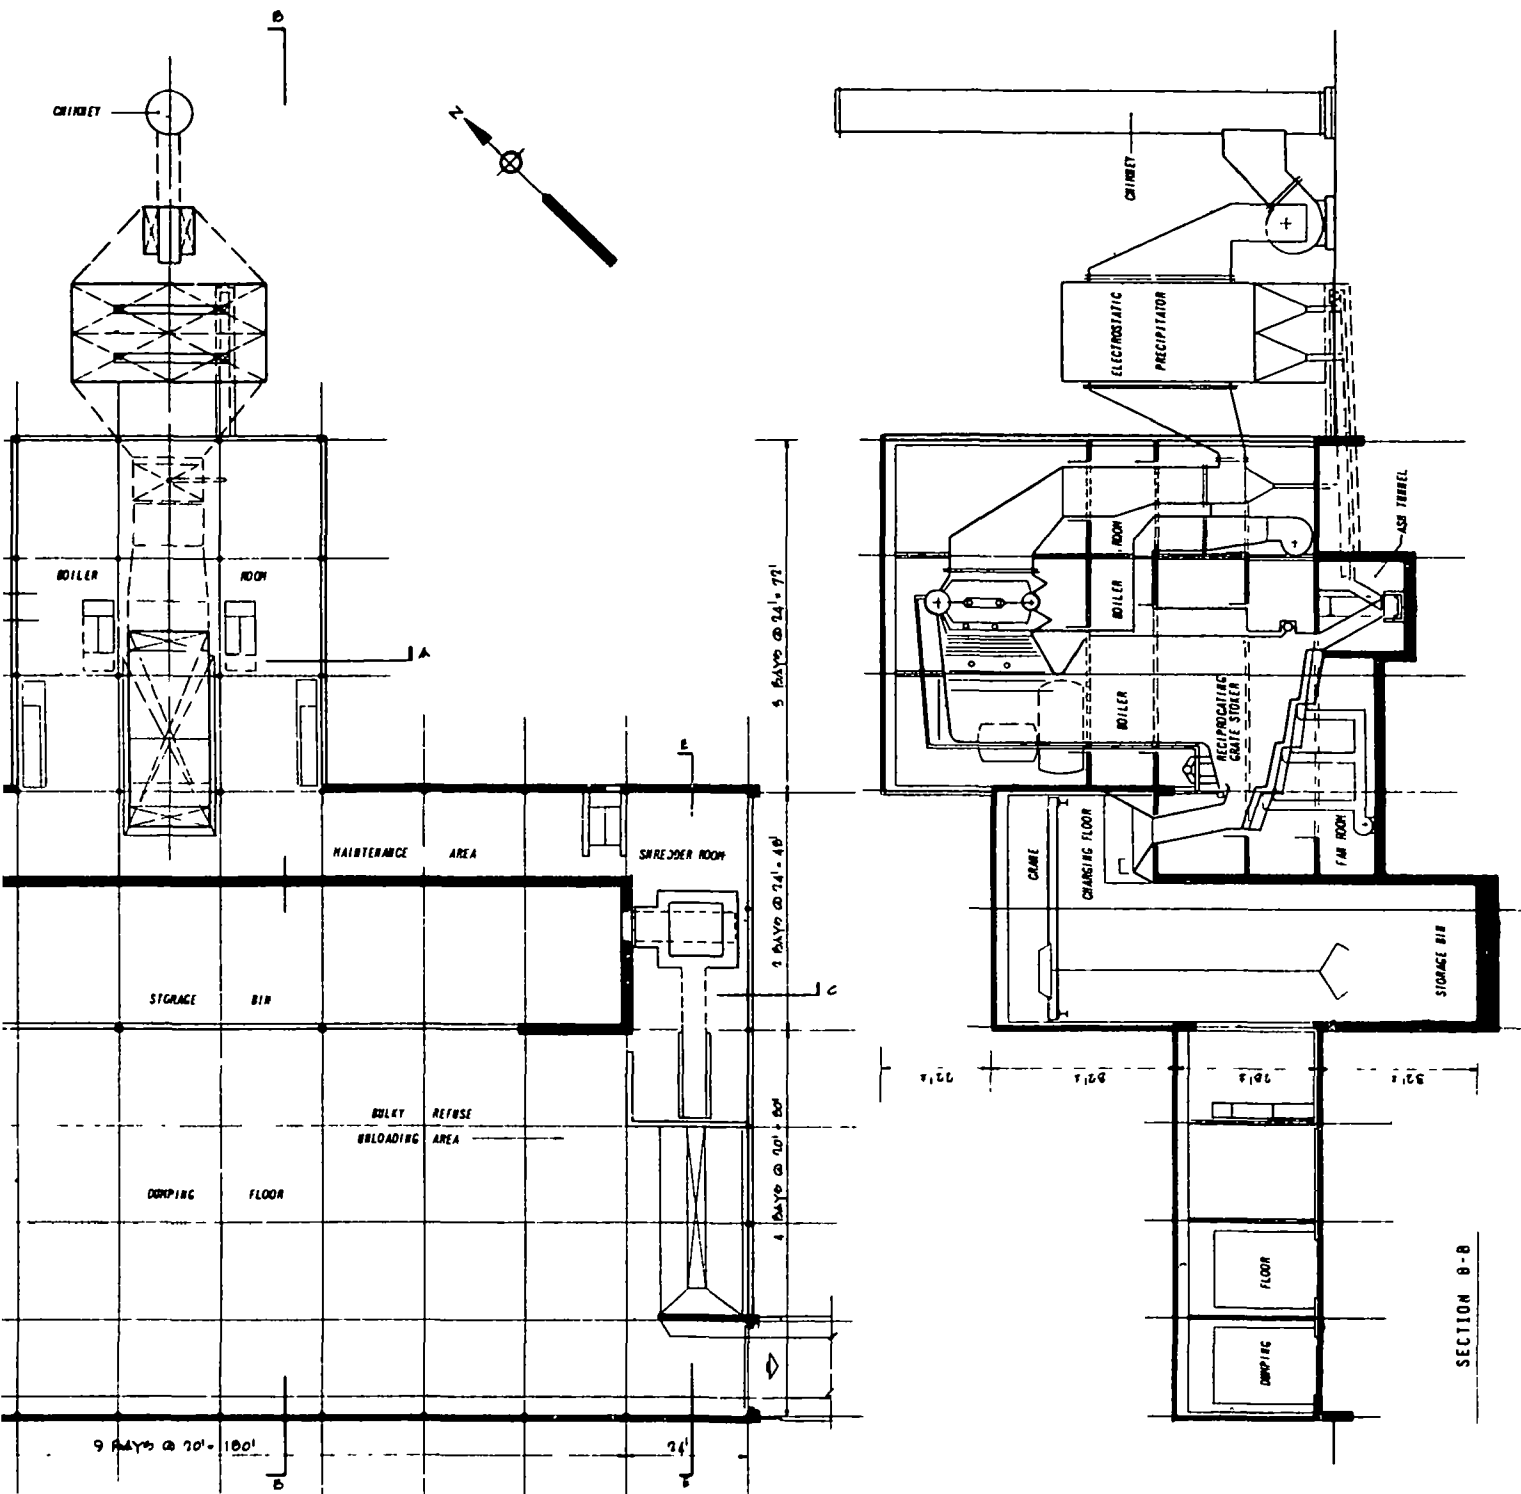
ALTERNATIVE B-1 - SITE PLAN,
